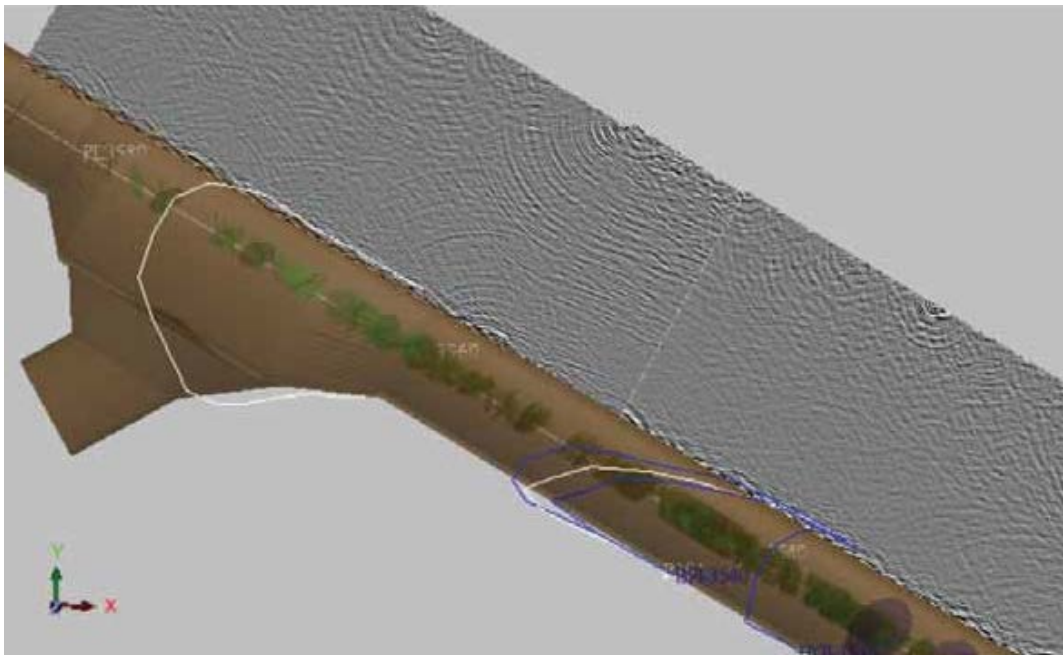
GPR image draped on tunnel wall in 3D, measured between chainage 3300 – 3600 m on right hand wall of ONKALO access tunnel, 270 MHz antenna. Range on the wall is less than 10 m (Heikkinen & Kantia 2011).
